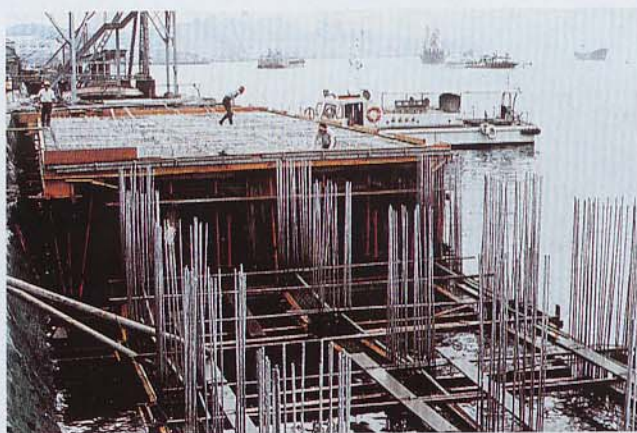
Galvanized steel rebar used in a dock in Japan.
